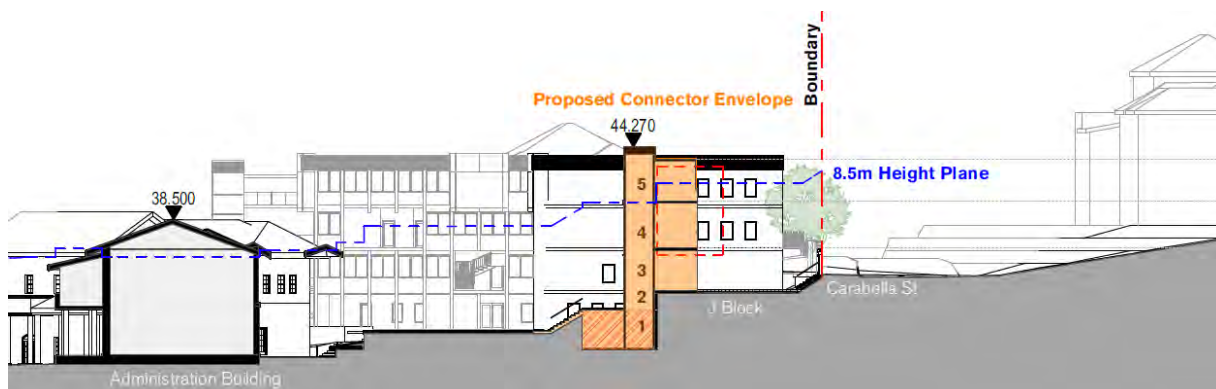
Section through the lift of the southern connector pod, showing the relationship of the new building to existing buildings in and around the school. (Source: fjmt, 'Southern Precinct Section', excerpt from MP-4002)
